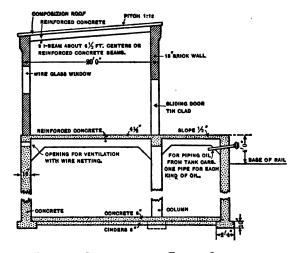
CROSS-SECTION OF TYPICAL OIL-HOUSE.
